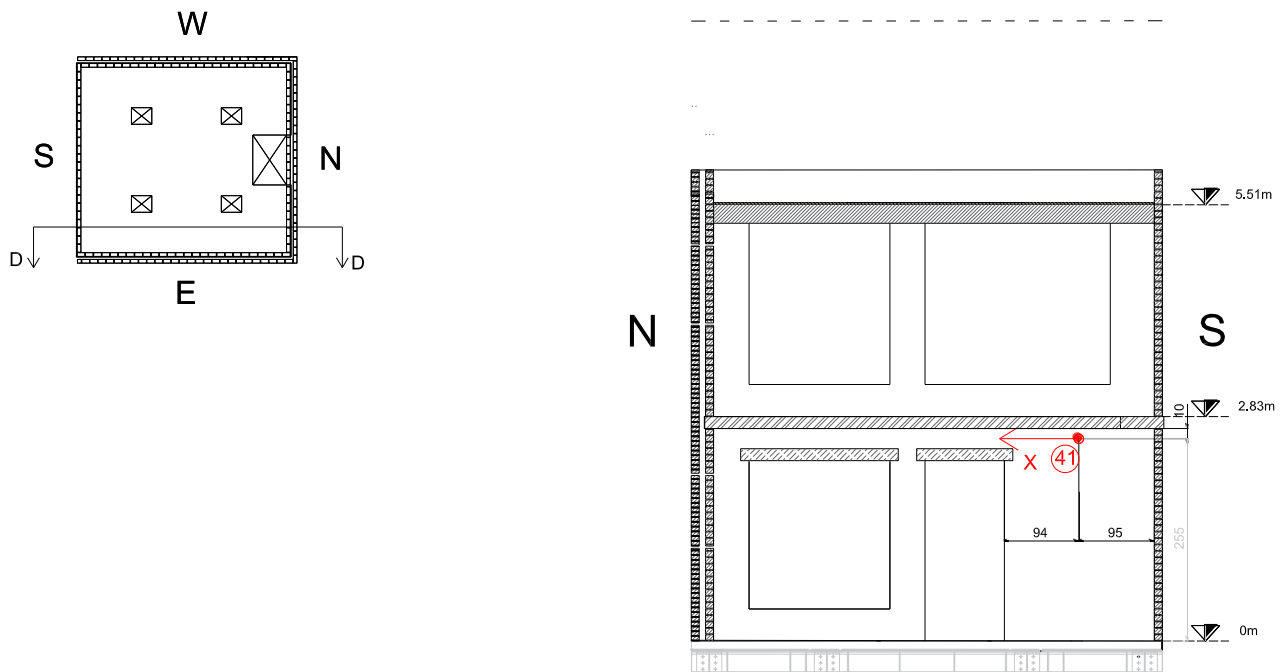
Accelerometer elevation: East calcium silicate inner leaf - Section D-D.
